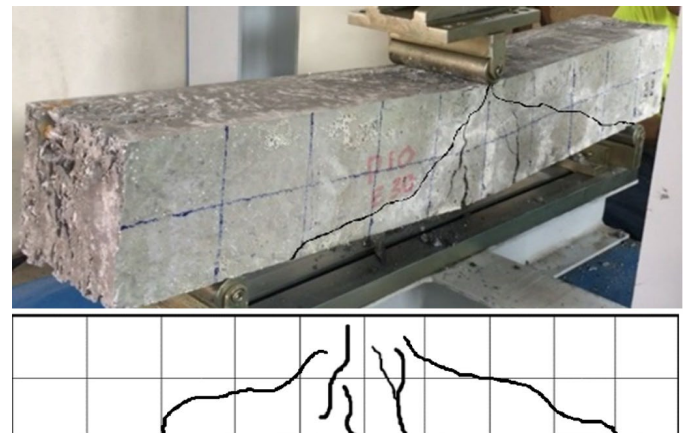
Reinforced concrete beam's crack pattern with 10% POFA and 30% EPS
